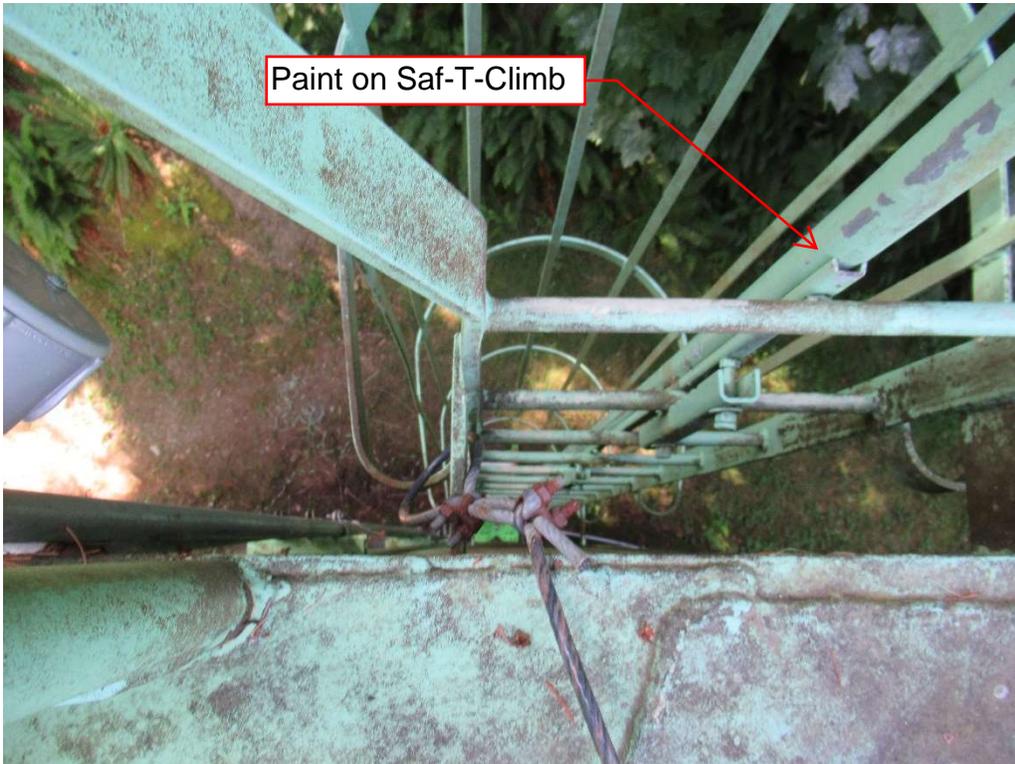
Safety line tied to ladder standoff. Note the Saf-T-Climb is painted.
